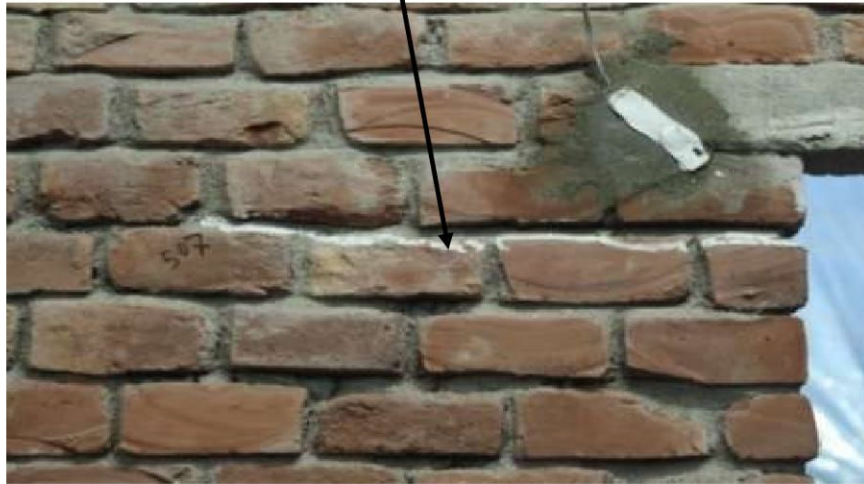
Specimen 2, Instrumentation and first crack formation of two storied single bay infill frame having door opening
